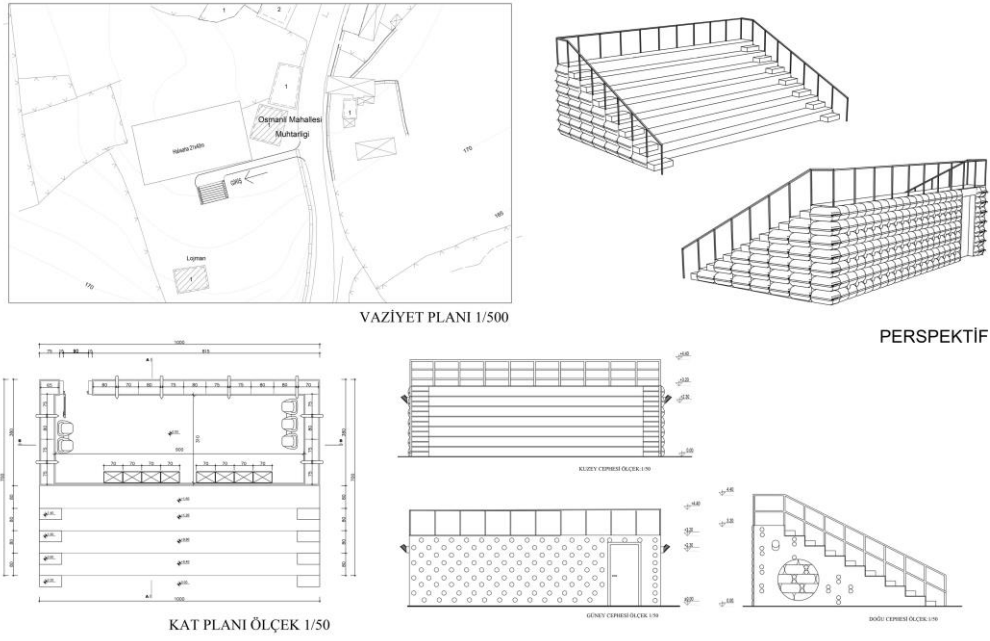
Layout plan, plan and views of the 7 x 10 m changing room and tribune designed with the earthbag technique
